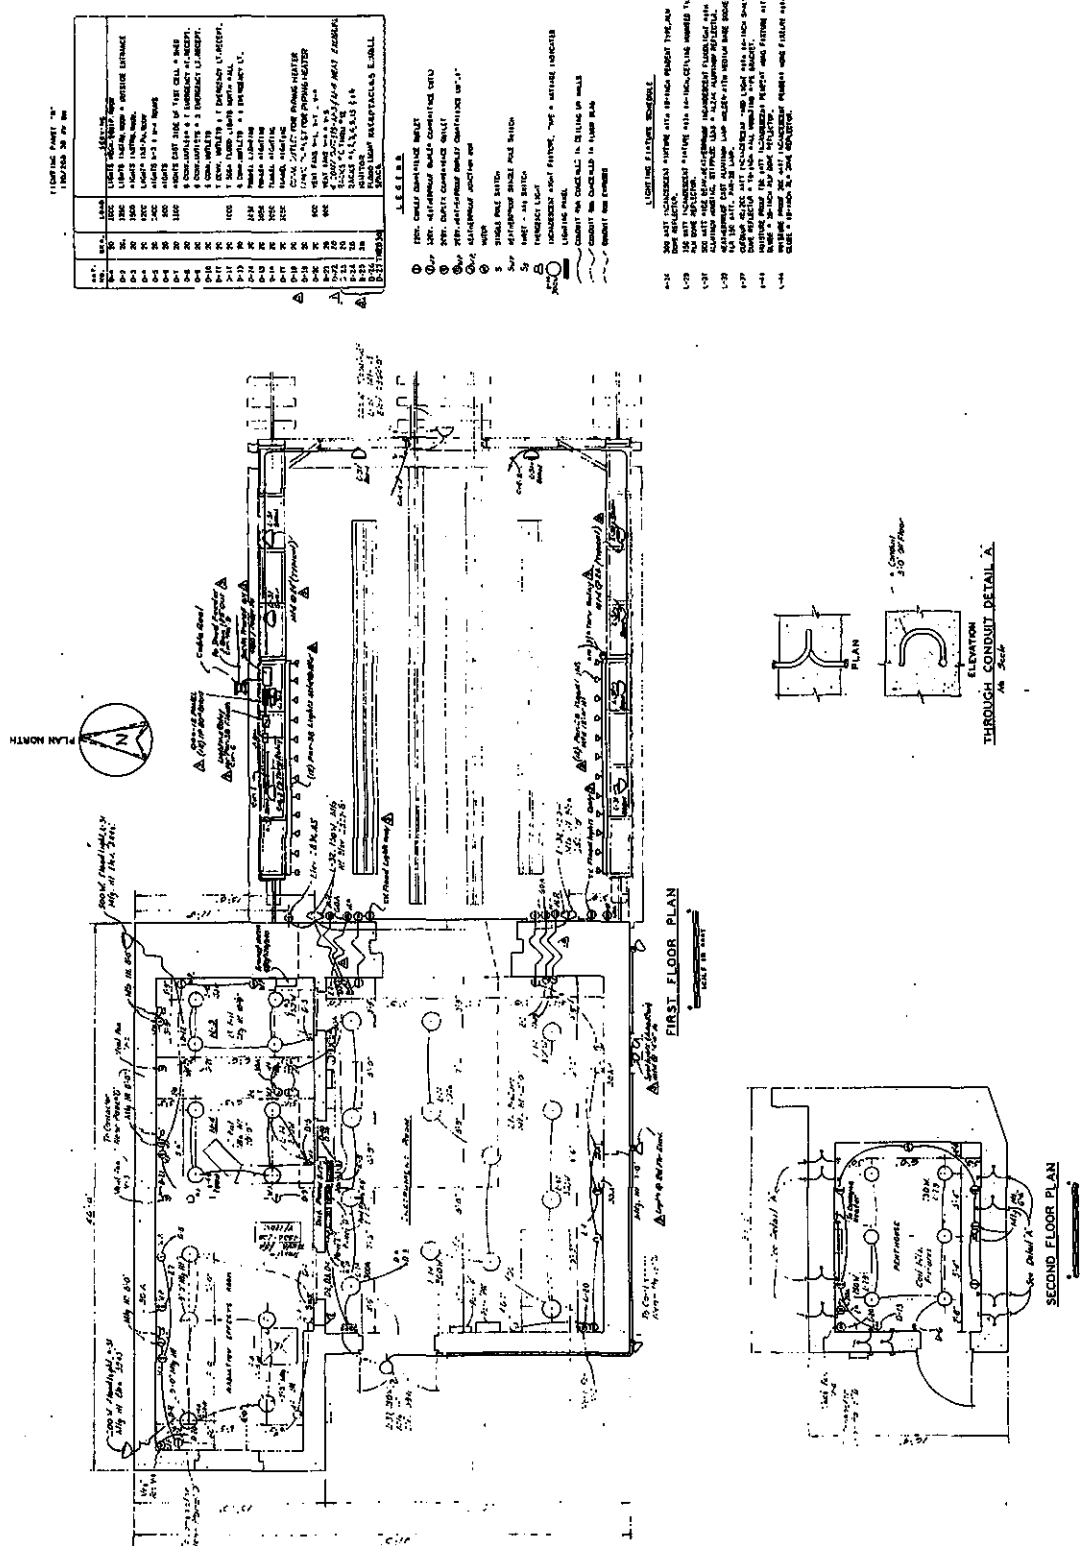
Lighting plan and details for building 3113 including penthouse, 1957.
